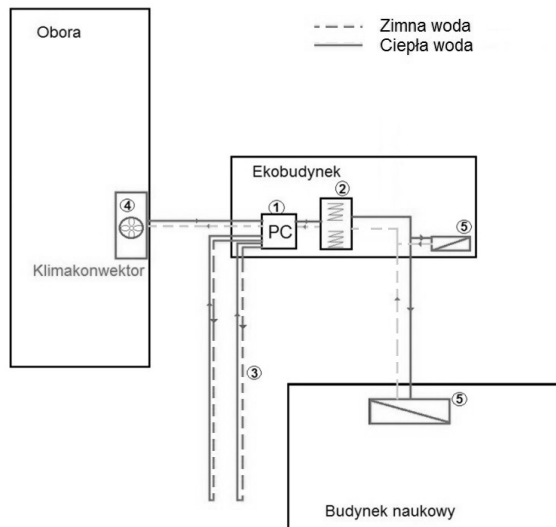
Block scheme of tested installation: 1 – heat pump; 2 – buffer tank; 3– vertical heat exchangers; 4-fan coil unit, 5 – heaters.
